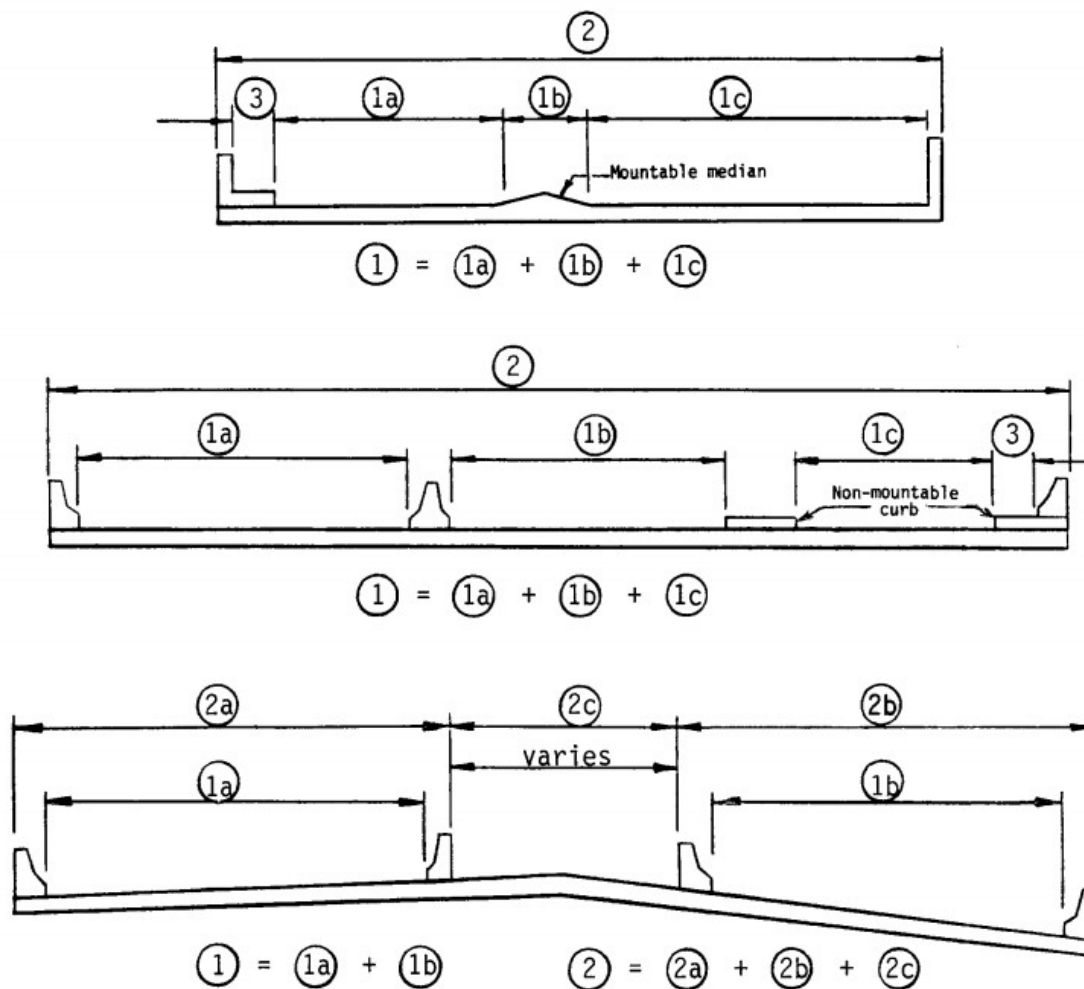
Bridge Deck Width Examples (FHWA 1995)
